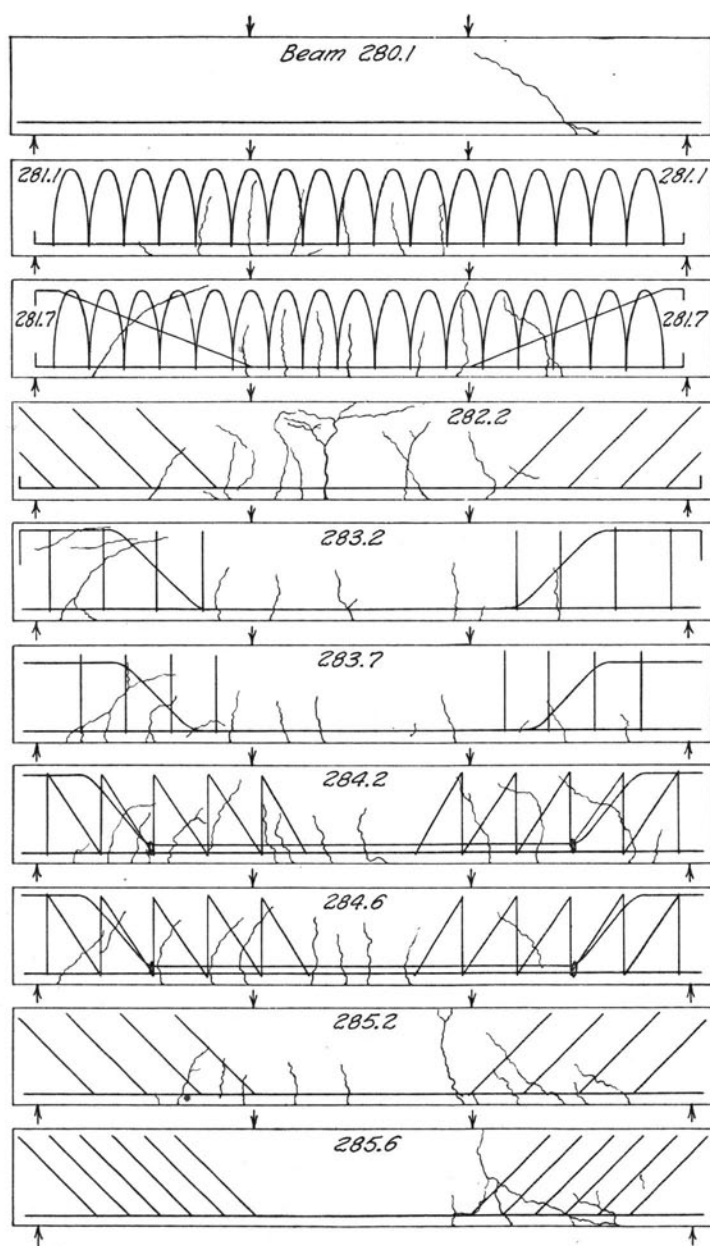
SKETCHES OF TYPICAL BEAMS AFTER FAILURE, SERIES OF 1910
